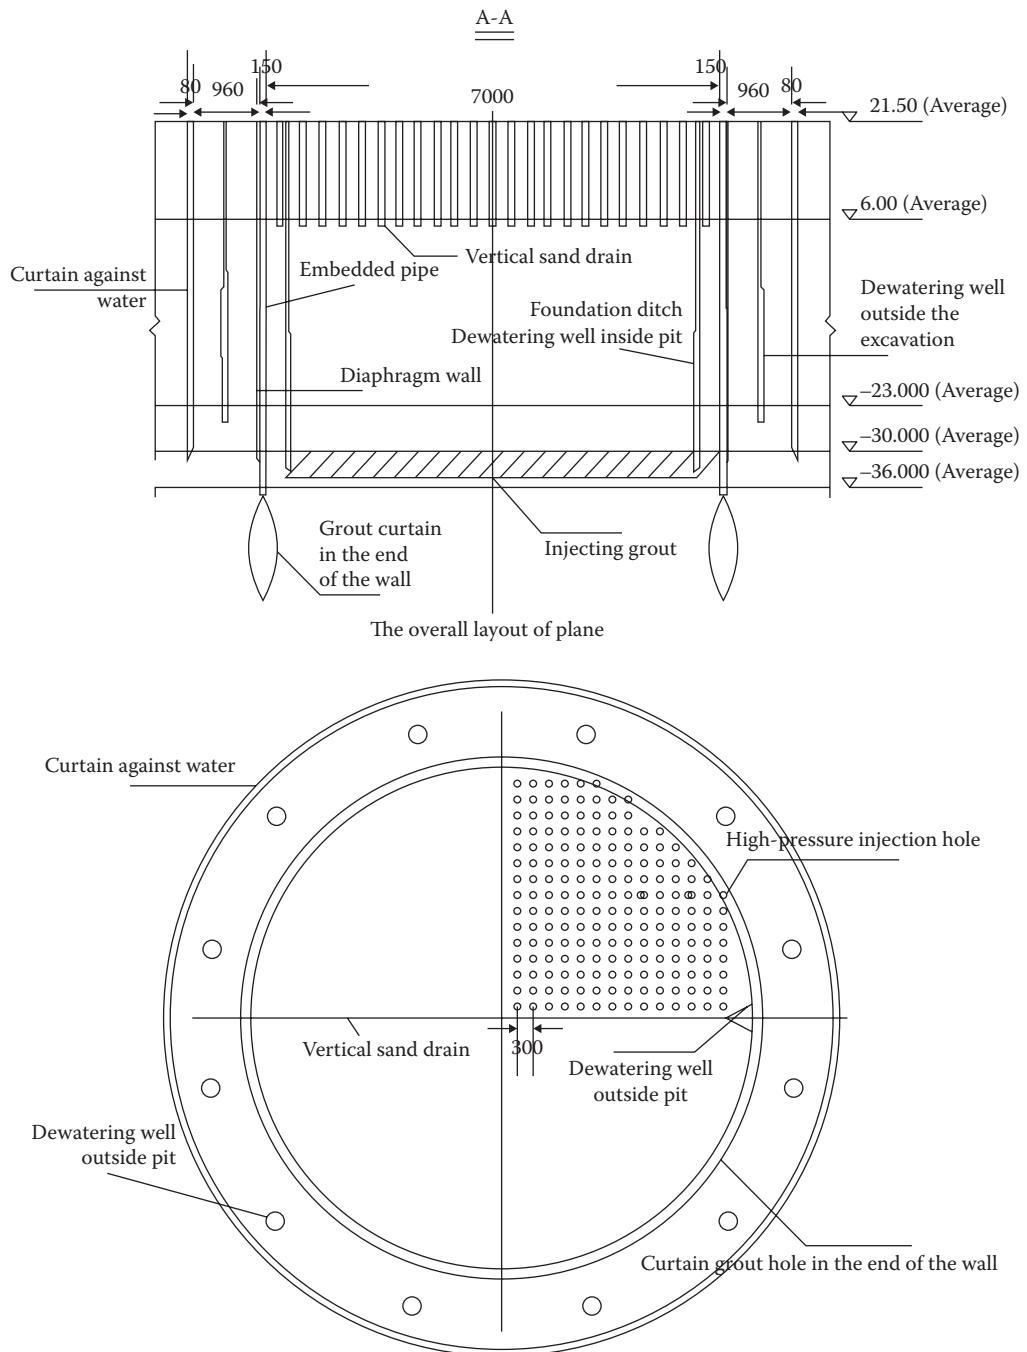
Sealing water, dewatering, and drainage system layout of foundation pit, Yangluo Bridge. (From Jiang, Z.Z., *Found. Hydraul. Eng.*, 6, 2006.)
